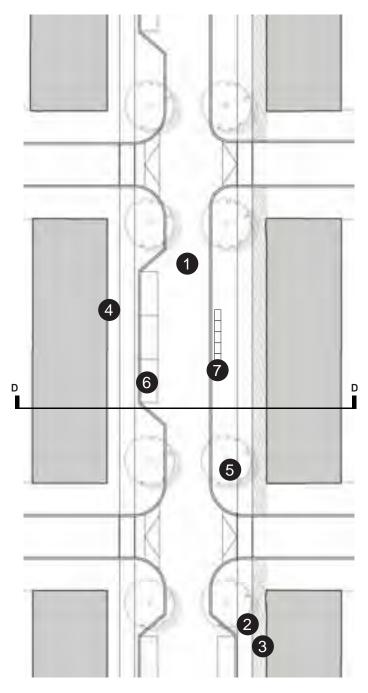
Secondary Street Scenario 2 with Parallel Parking Illustrative Plan
